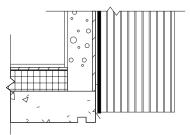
Final Classroom Wing Section and Details Hausladen, G. (2013). Final Classroom Wing Section and Details. [Designer]
